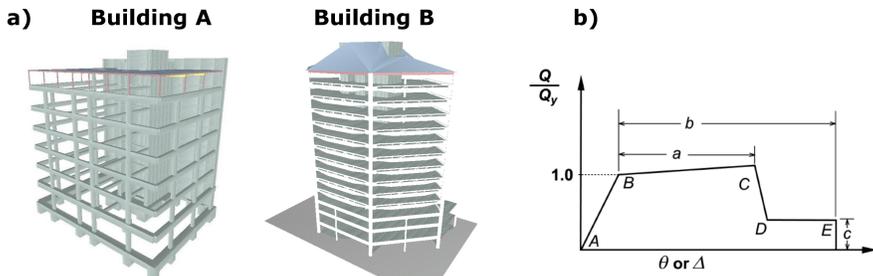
a) 3D View of Building A and B. b) Nonlinear model of concrete elements (FEMA356).
